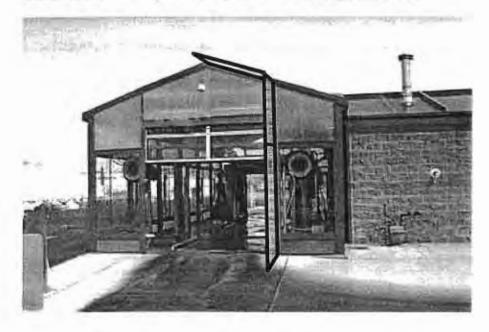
Proposed noise barrier structure. The extension is 4-ft long.
